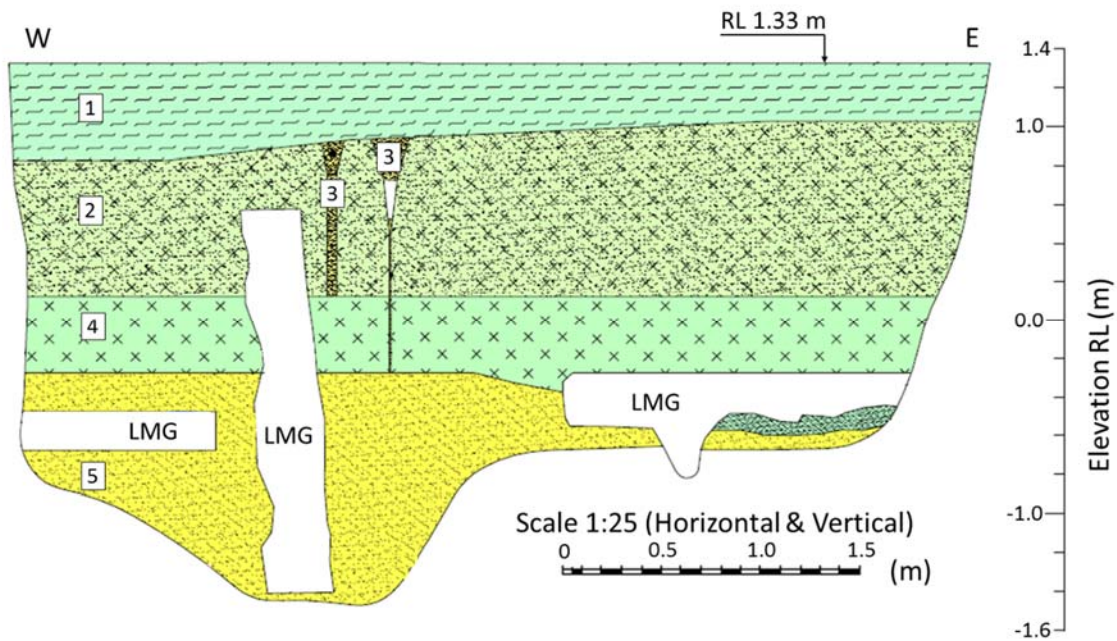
Cross-section of excavation trench at the 3-LMG-1 Test Panel. Modified from van Ballegooy et al. 2017.
